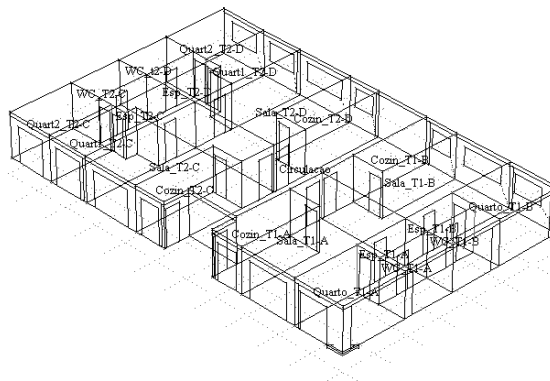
3-d wireframe representation of the building floor plan (Leal, Ferreira e Oliveira Fernandes 2008)
